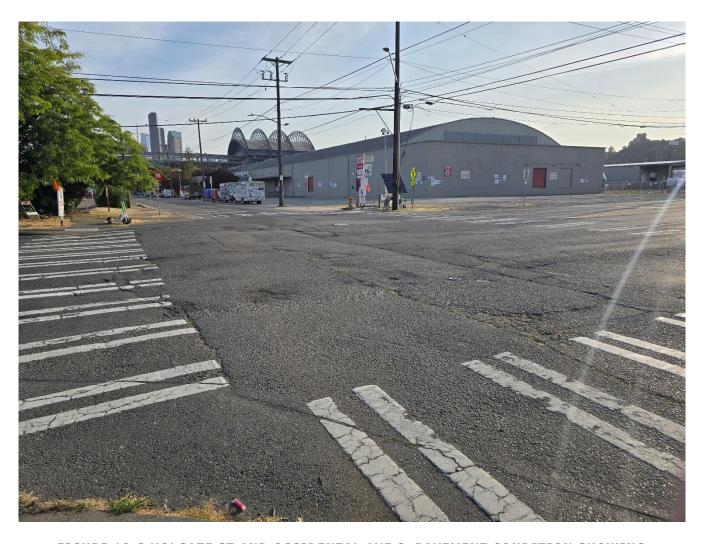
S HOLGATE ST AND OCCIDENTAL AVE S, PAVEMENT CONDITION SHOWING ALIGATORING AND CRACKING, SW CORNER LOOKING NE
